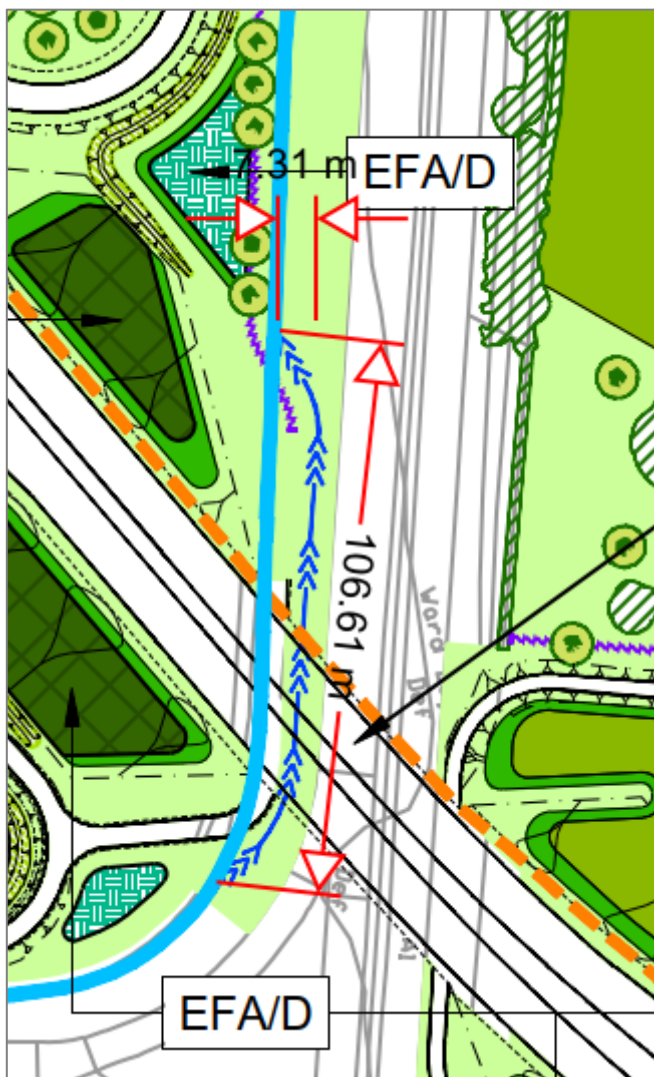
Slough Dyke realignment – extract from AS-007 (General Arrangement Plans) Sheet 25005
